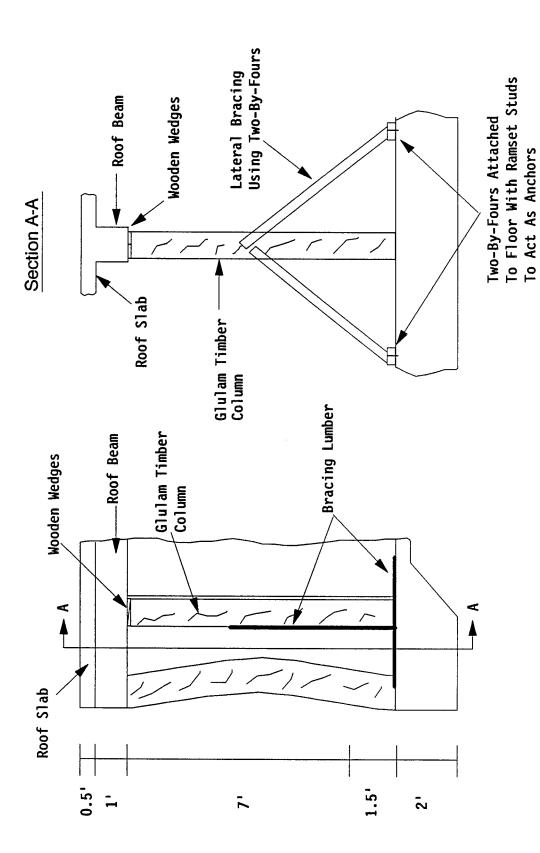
Detail of Column Replacement with Bracing Lumber in Place.
